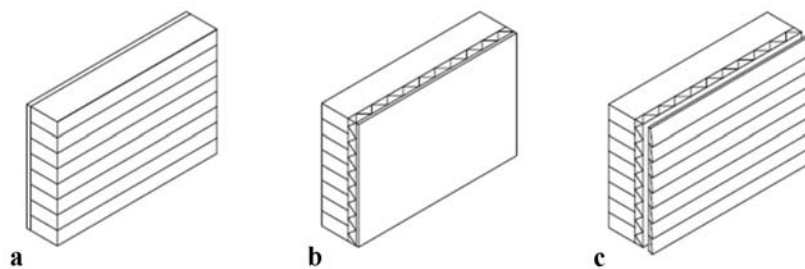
3: a) Solid wall construction; b) Warm façade. c) Cold façade. From the book “Façade” Knaack U., Klein T., Bilow M., 010 Publishers, Rotterdam 2008. pg.14
